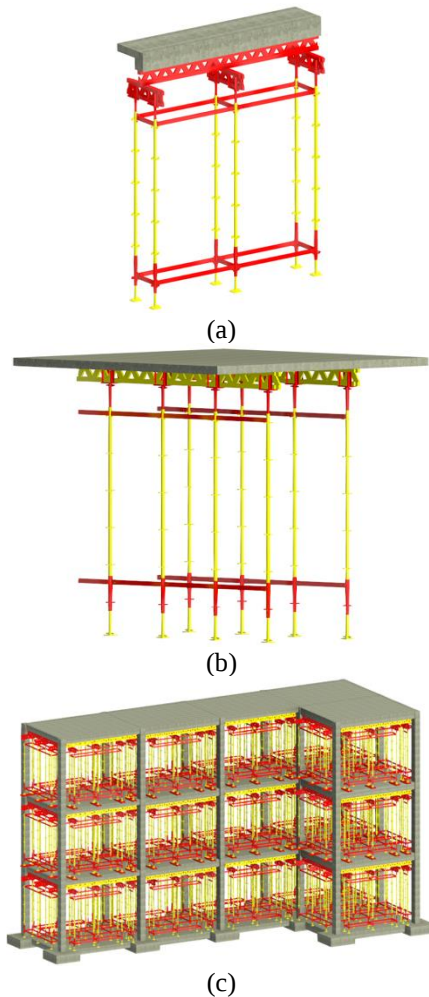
Shoring system configuration for (a) beam shoring, (b) slab reshoring, and (c) overall shoring system
